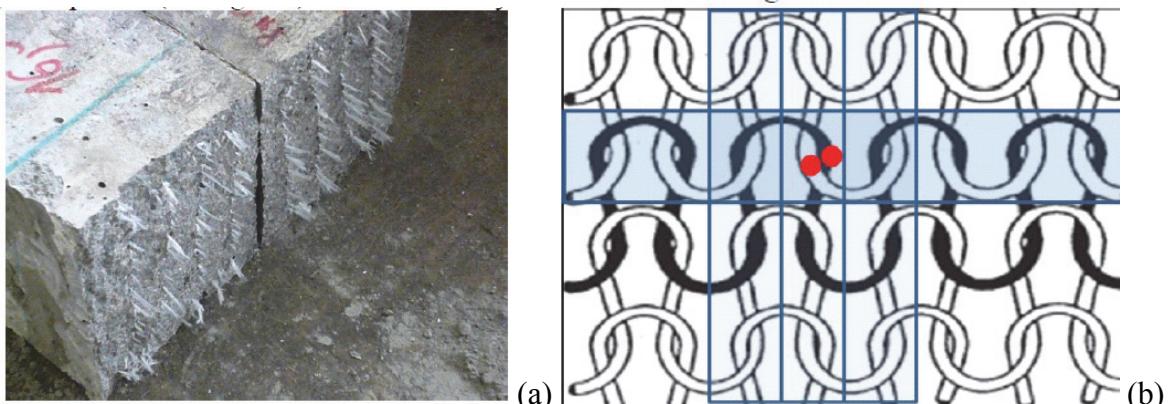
(a) Concrete samples with 4-ply knitted reinforcement after fracture;
